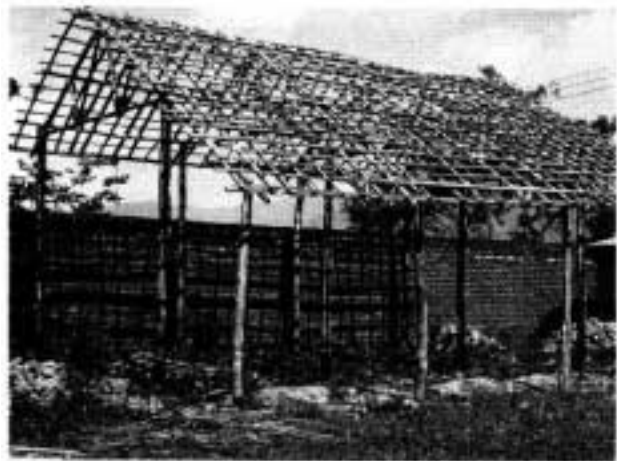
Bamboo house (under construction) showing roof grid, eucalyptus poles and gusseted bamboo truss.
